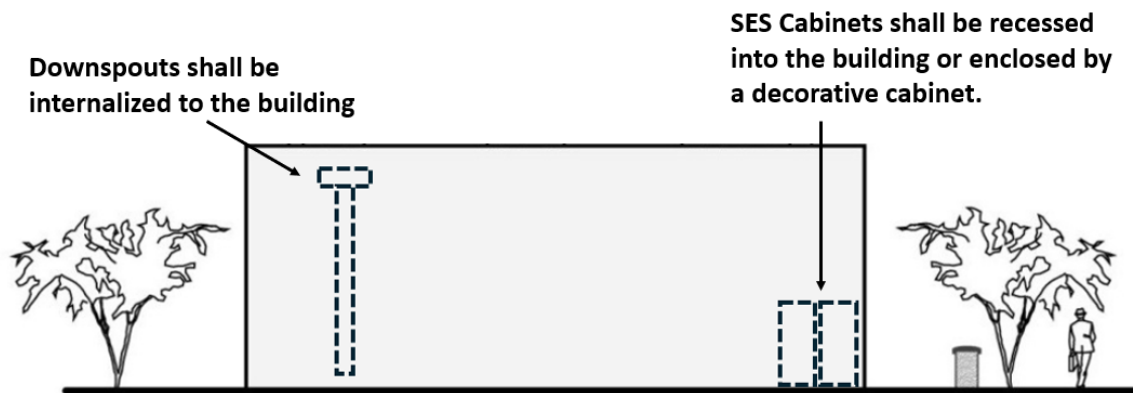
A.3. Screening of Exterior Wall-Mounted Equipment
